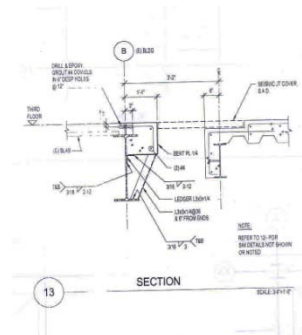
Typical connection between New Acute Care Hospital and existing structure
